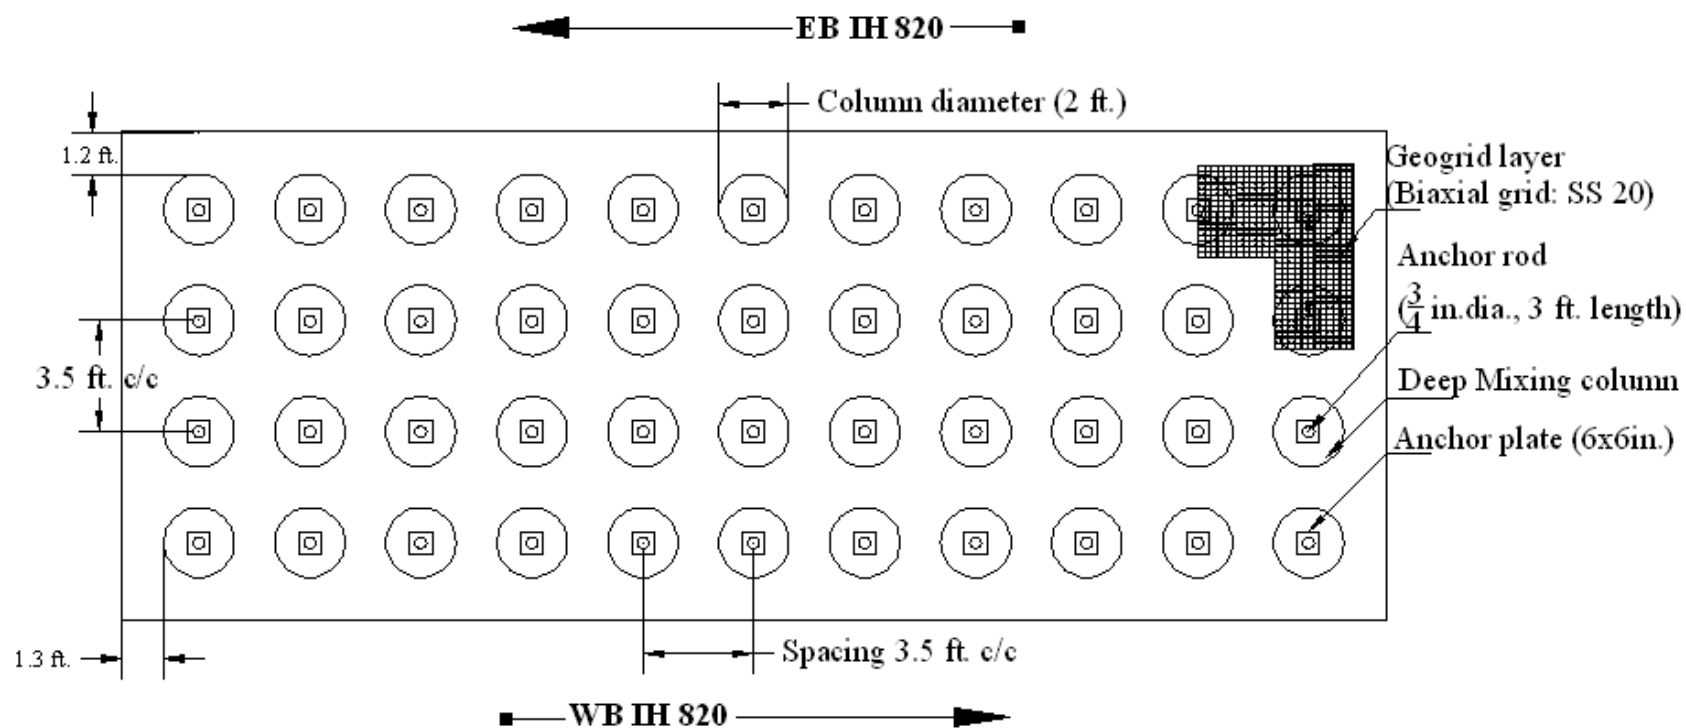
Plan view of DSM column layout of test Site 1 (15 ft × 40 ft).
